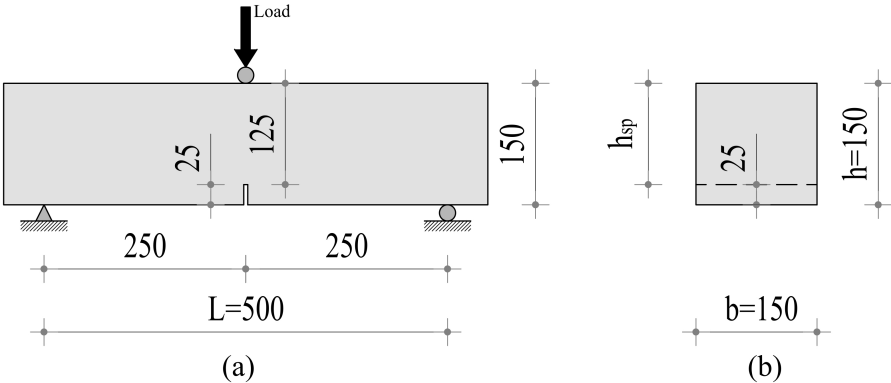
EN 14651 [7] test methodology: (a) Front view of the beam specimen; (b) Cross section of beam specimen (dimensions in mm).
